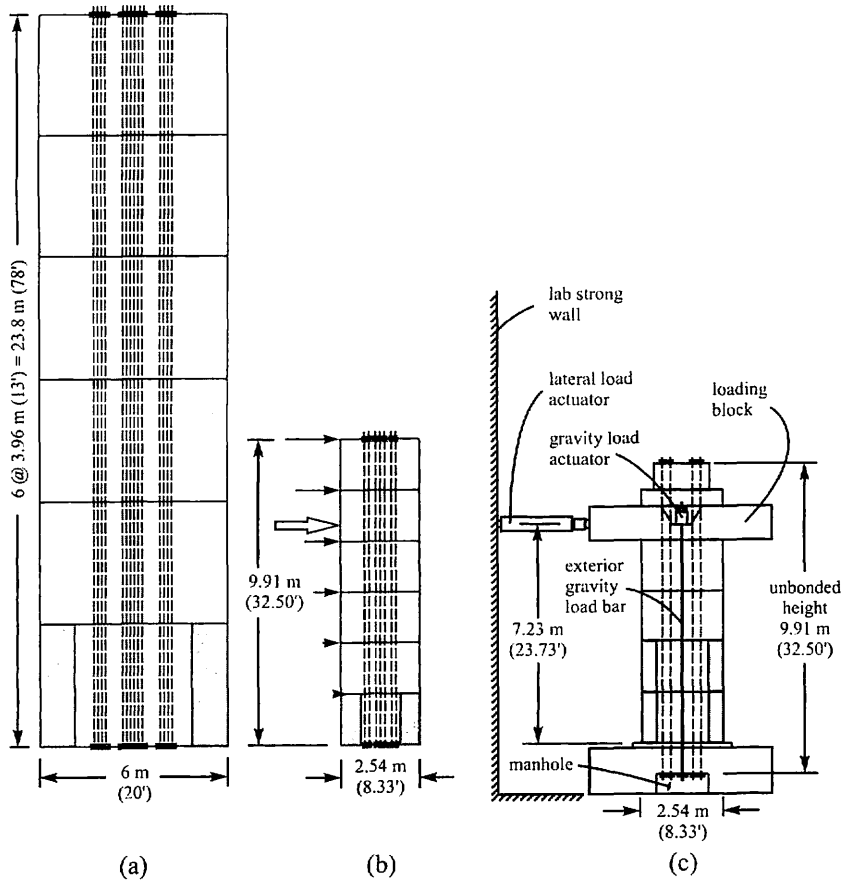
Elevation view: (a) full-scale wall; (b) scaled wall; (c) test wall.
